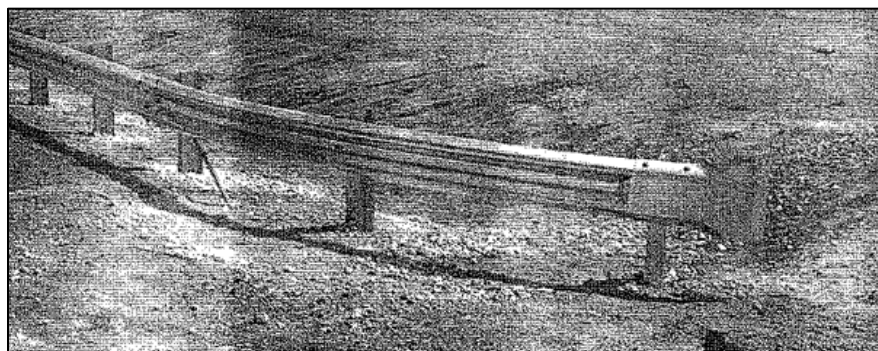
Vermont W-Beam Guardrail Terminal (2).
